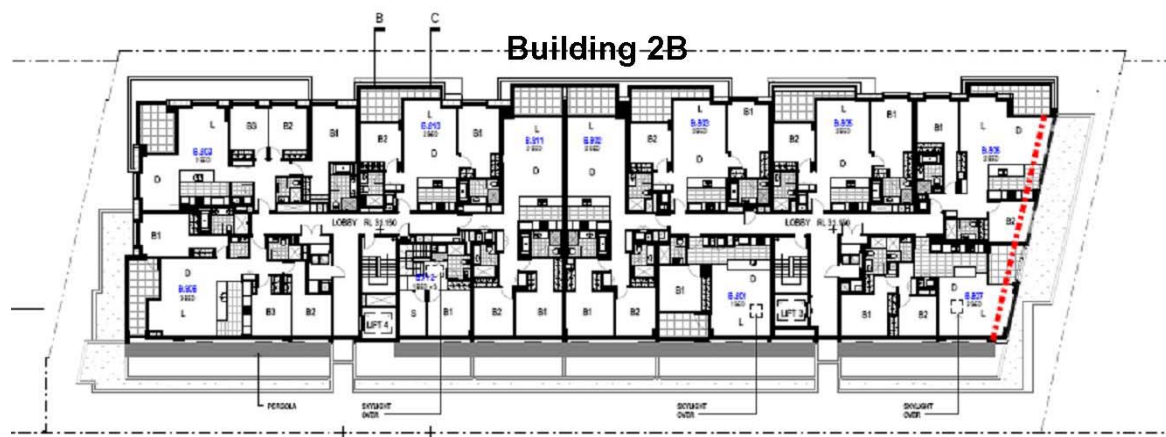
Building 2B – Level 8 - encroachment into northern setback area shown dashed.
